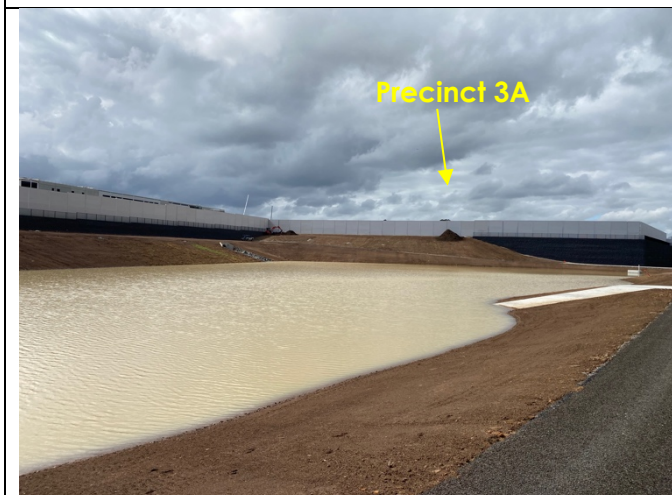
Looking southeast from the western boundary. Photo shows the detention basin and retaining wall and sound barrier.
